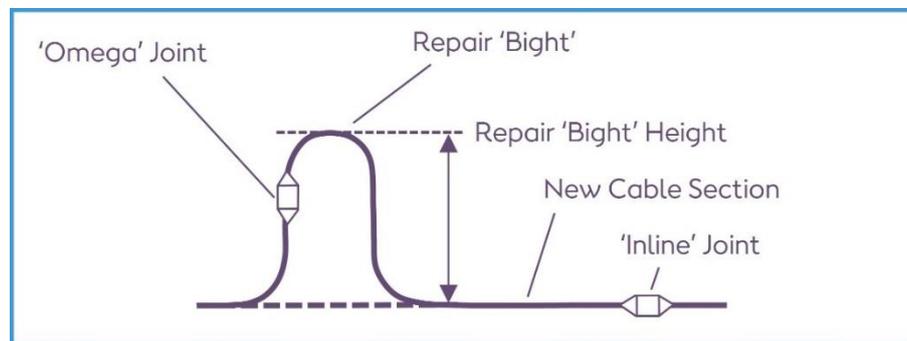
Indicative Top-Down View of a Typical Cable Repair
